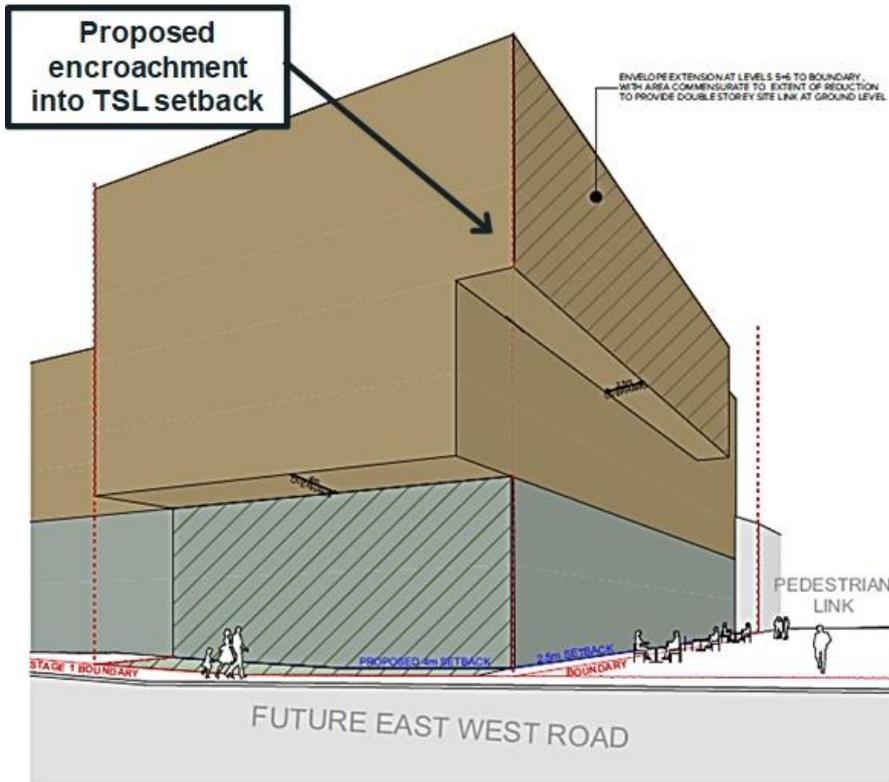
Perspective drawing of proposed upper level envelope encroachment into TSL setback
